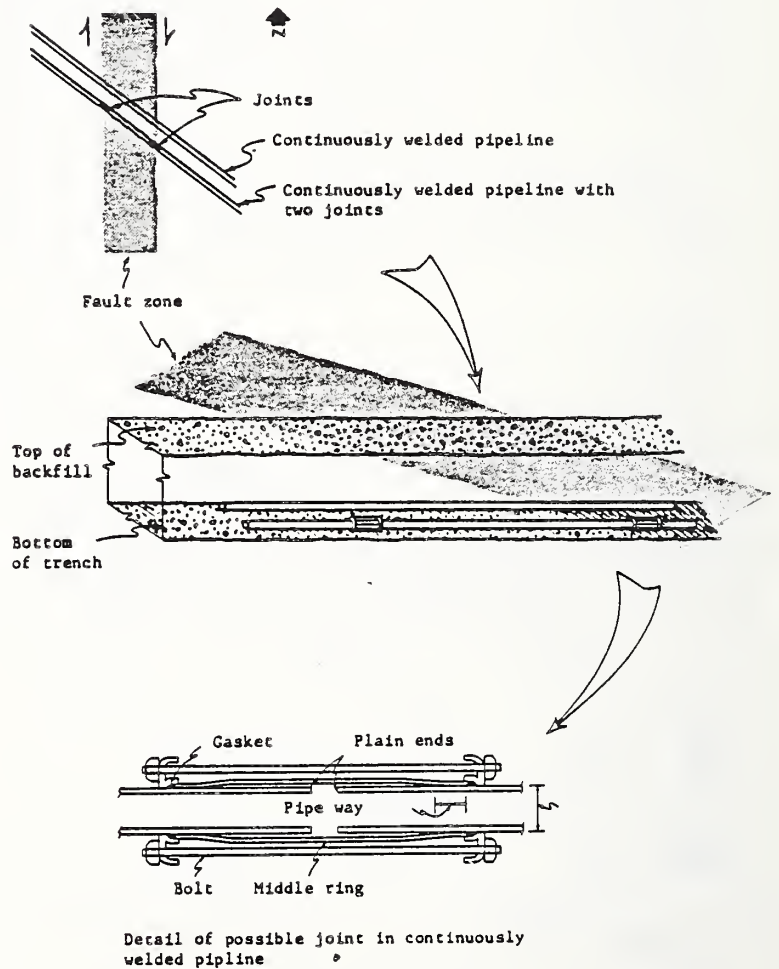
Continuously Welded Pipeline with Two Joints, Laid Adjacent to Continuously Welded Pipeline without Joint
